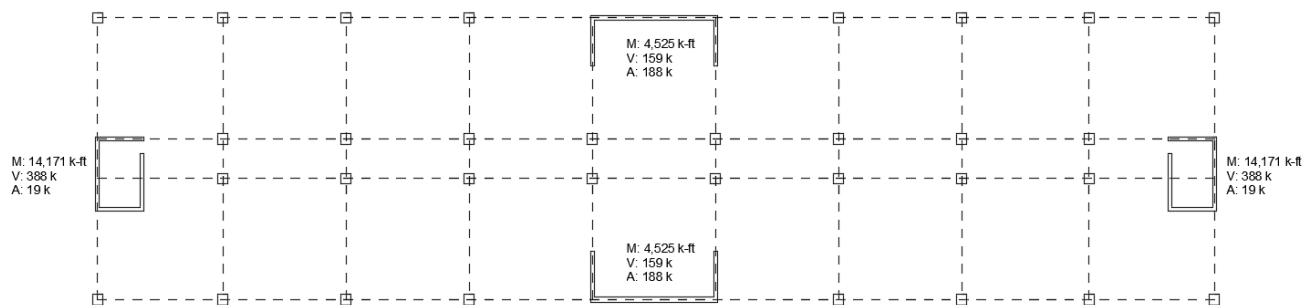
ETABS output of axial load, shear force and bending moment at the base of each structural wall 2nd floor
